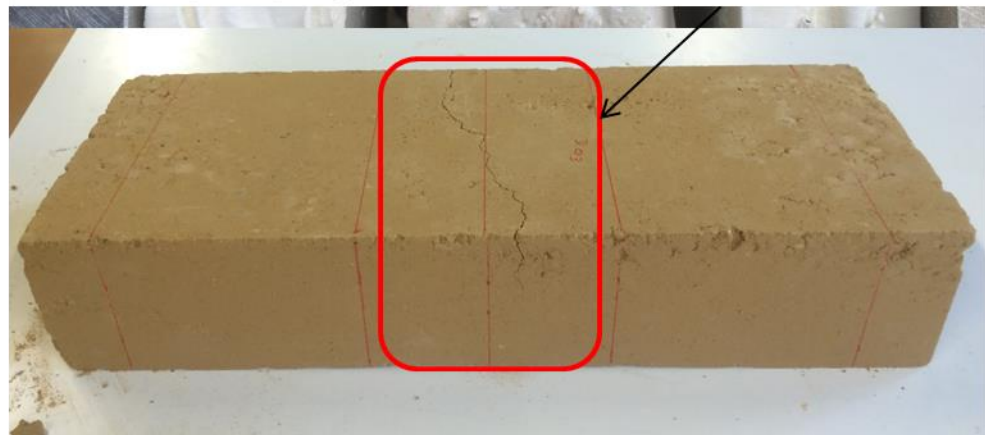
Failure of USRE beam specimens under 4 point bending test
